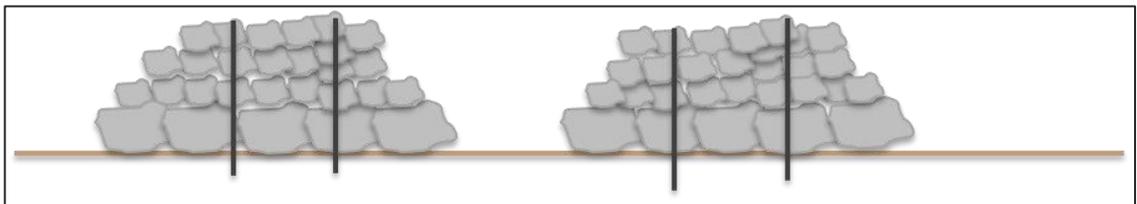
Showing the construction of a gapped sill using stacked rocks, and rebar placed through the sill and into the ground for support
